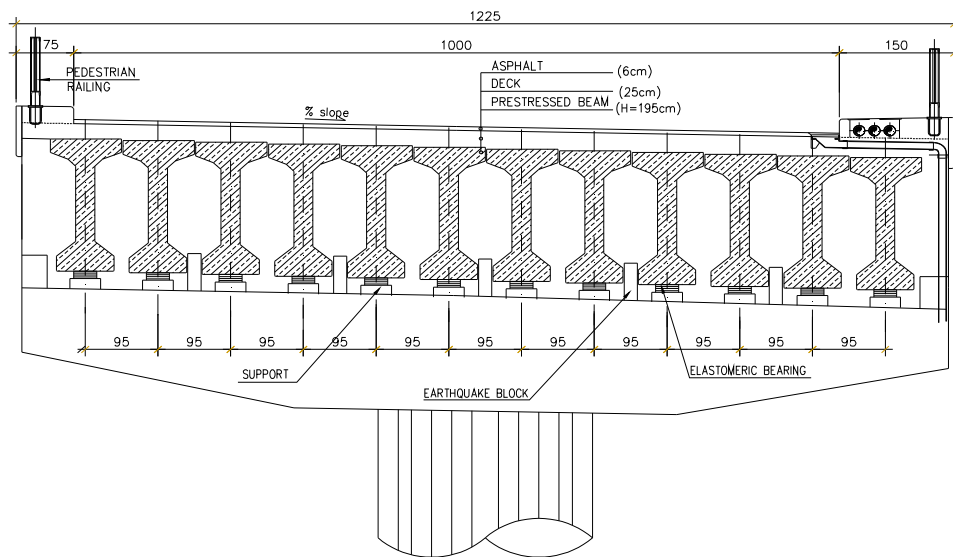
Bridge Cross-Section for Span Length of 40 m
